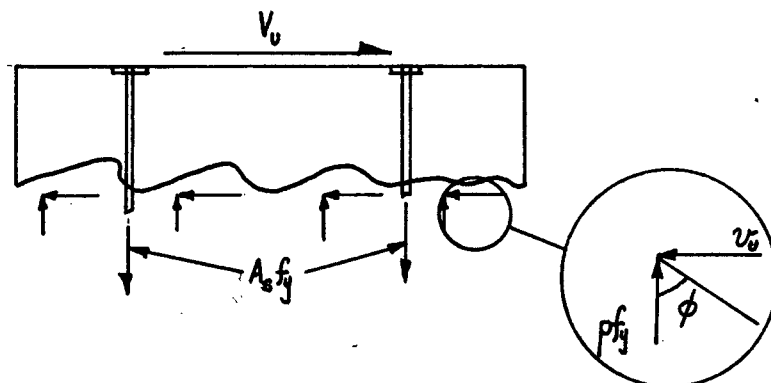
Shear-friction in Cracked Concrete Specimen
